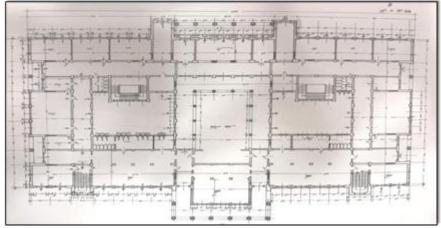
Gazi Education Institute, Ground Floor Plan, (Yavuz, Y, Empire to Republic Architect Kemalettin 1870-1927, Source: GEEA)
